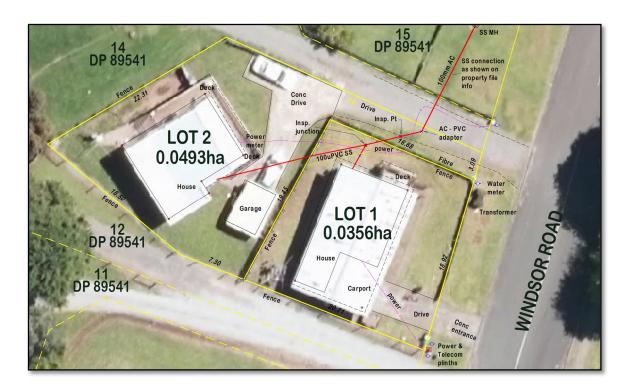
Schematic subdivision plan of the site (sourced: Survey and Planning Solutions 2010 Ltd.)
